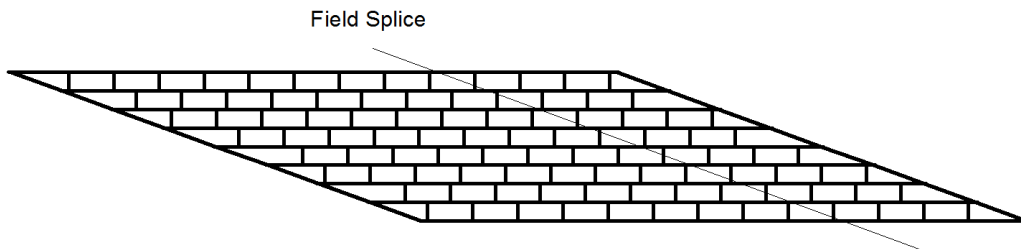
Critical erection stage of Bridge (J1) NISSS54 for TDLF detailing.
